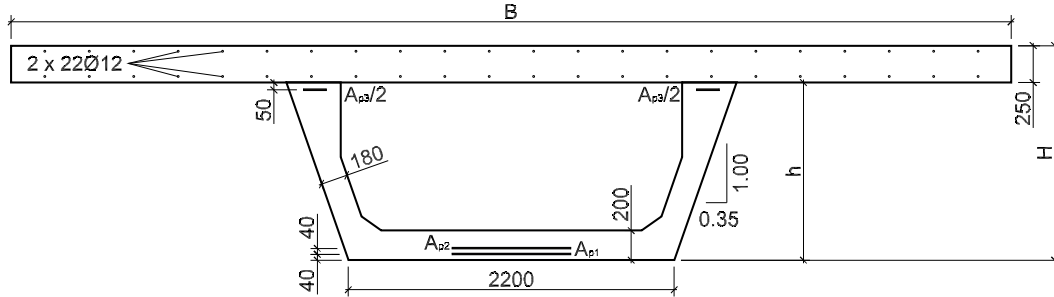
Cross-section of prestressed concrete U-shape girder (dim. [mm]).
